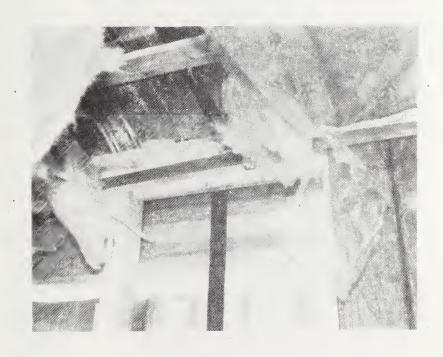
Hurricane Strap in Exposed Roof and Wall Construction
